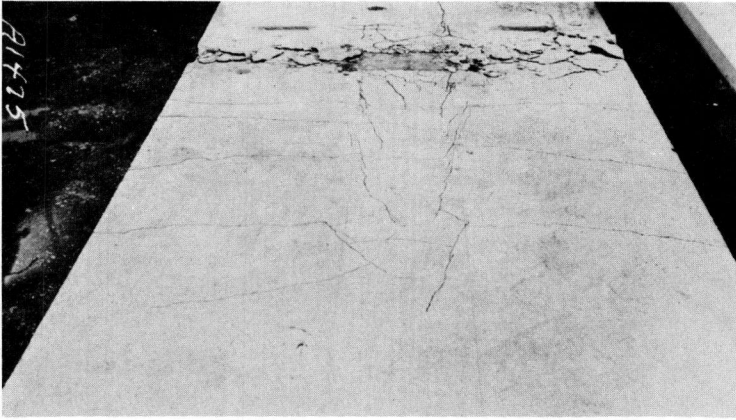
Slab-cracking pattern, composite shear test, pretensioned beam.
